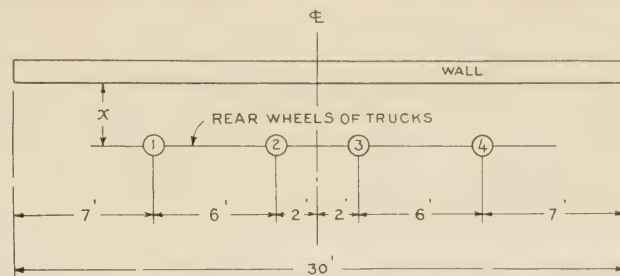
PLAN OF ABUTMENT WALL, SHOWING POSITION OF REAR WHEELS OF 2 TRUCKS.
